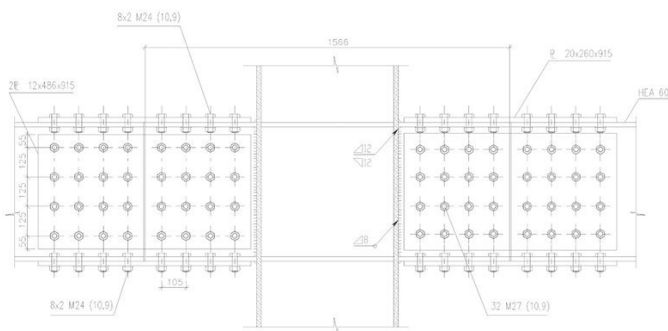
Rigid beam to column connection through a beam end plate and a haunch
